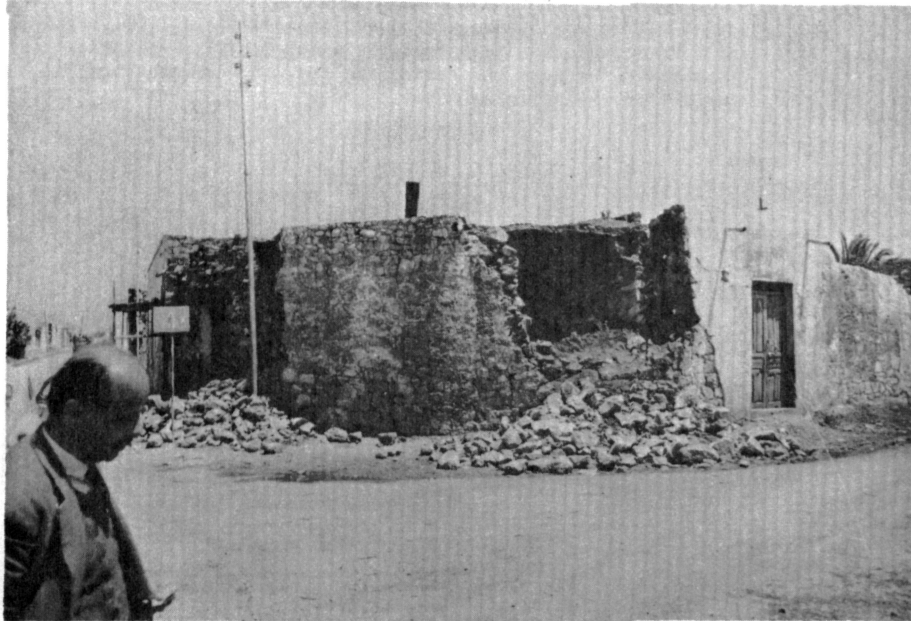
An example of collapse of rubble stone walls which enclosed the inside frame consisting of discarded metallic rolling stock. To the right is a building of stone block under construction which is provided with reinforced concrete columns that was saved from collapse.
